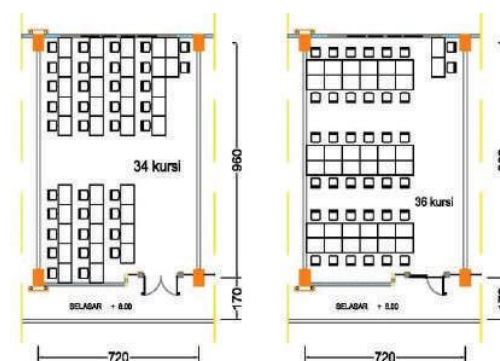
305 Classroom (Left) and 101 Classroom Existing Layout
